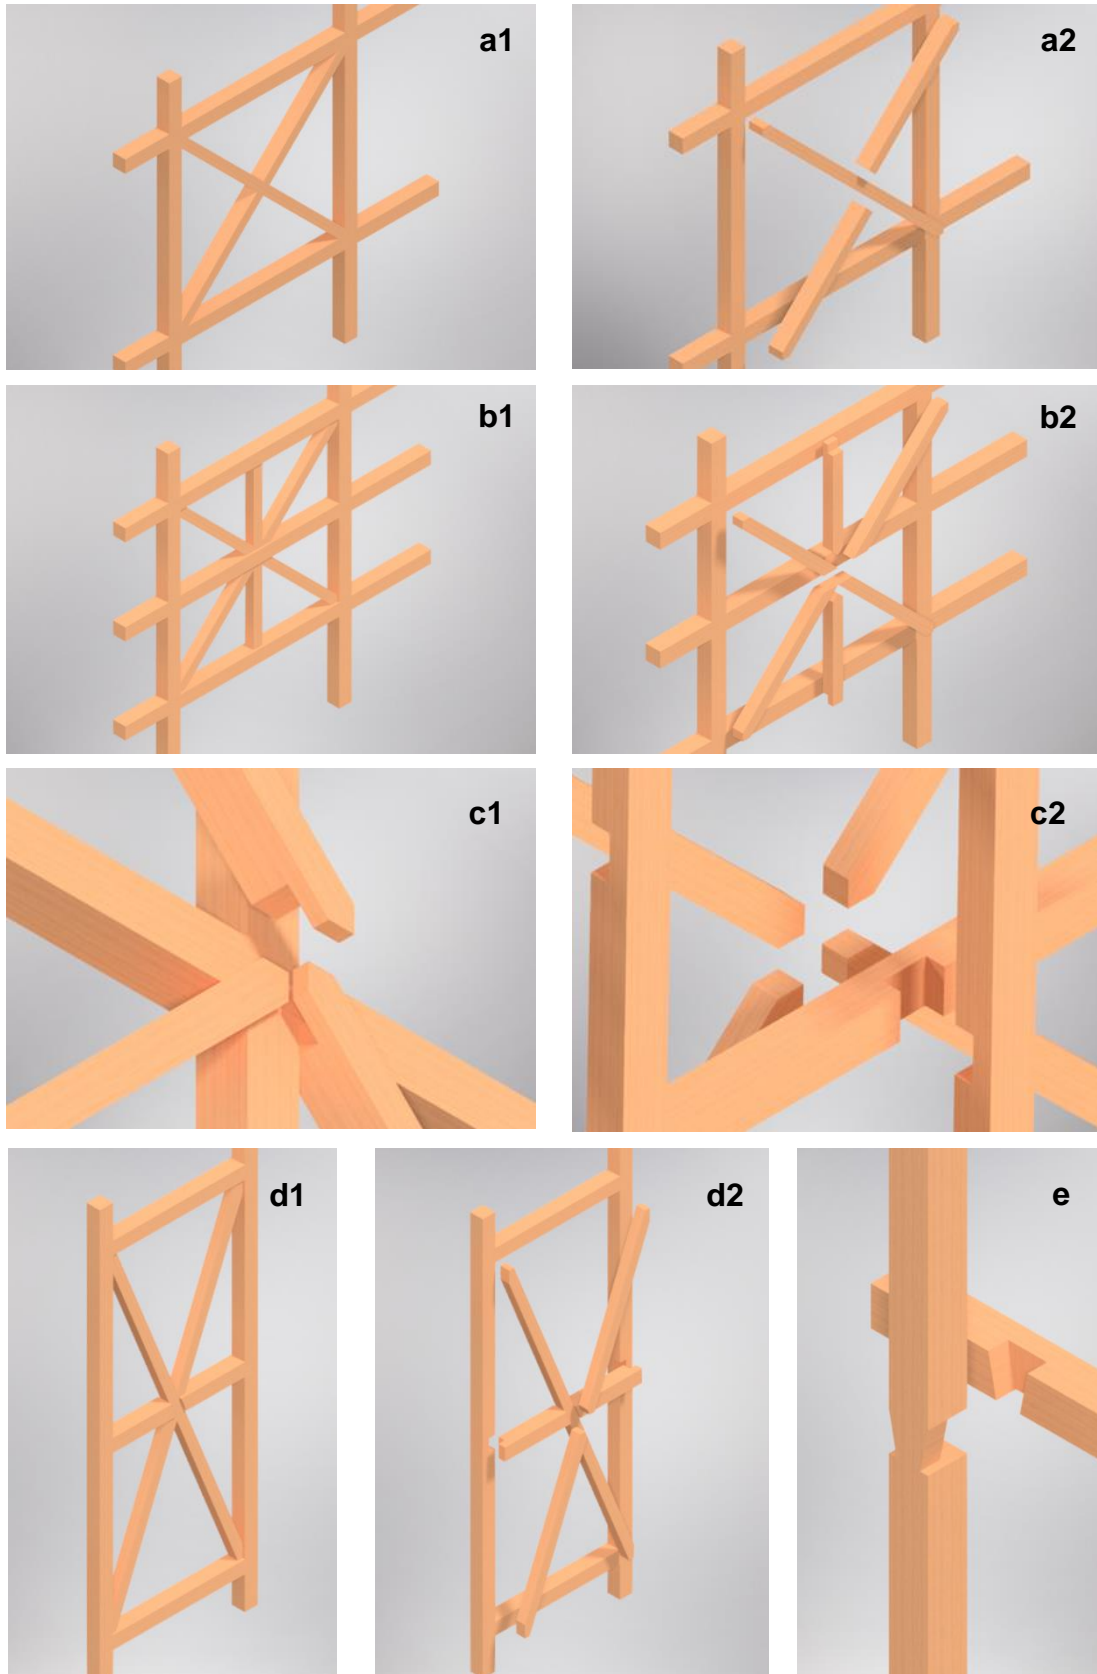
Examples of structural walls (*frontais*) connections schematic representation (Adapted from (Mascarenhas, 2004)). – a1, b1, c1, d1 – Assembled view; a2, b2, c2, d2 – Exploded view; e - special connection used in interconnect prumos and travessanhos.
